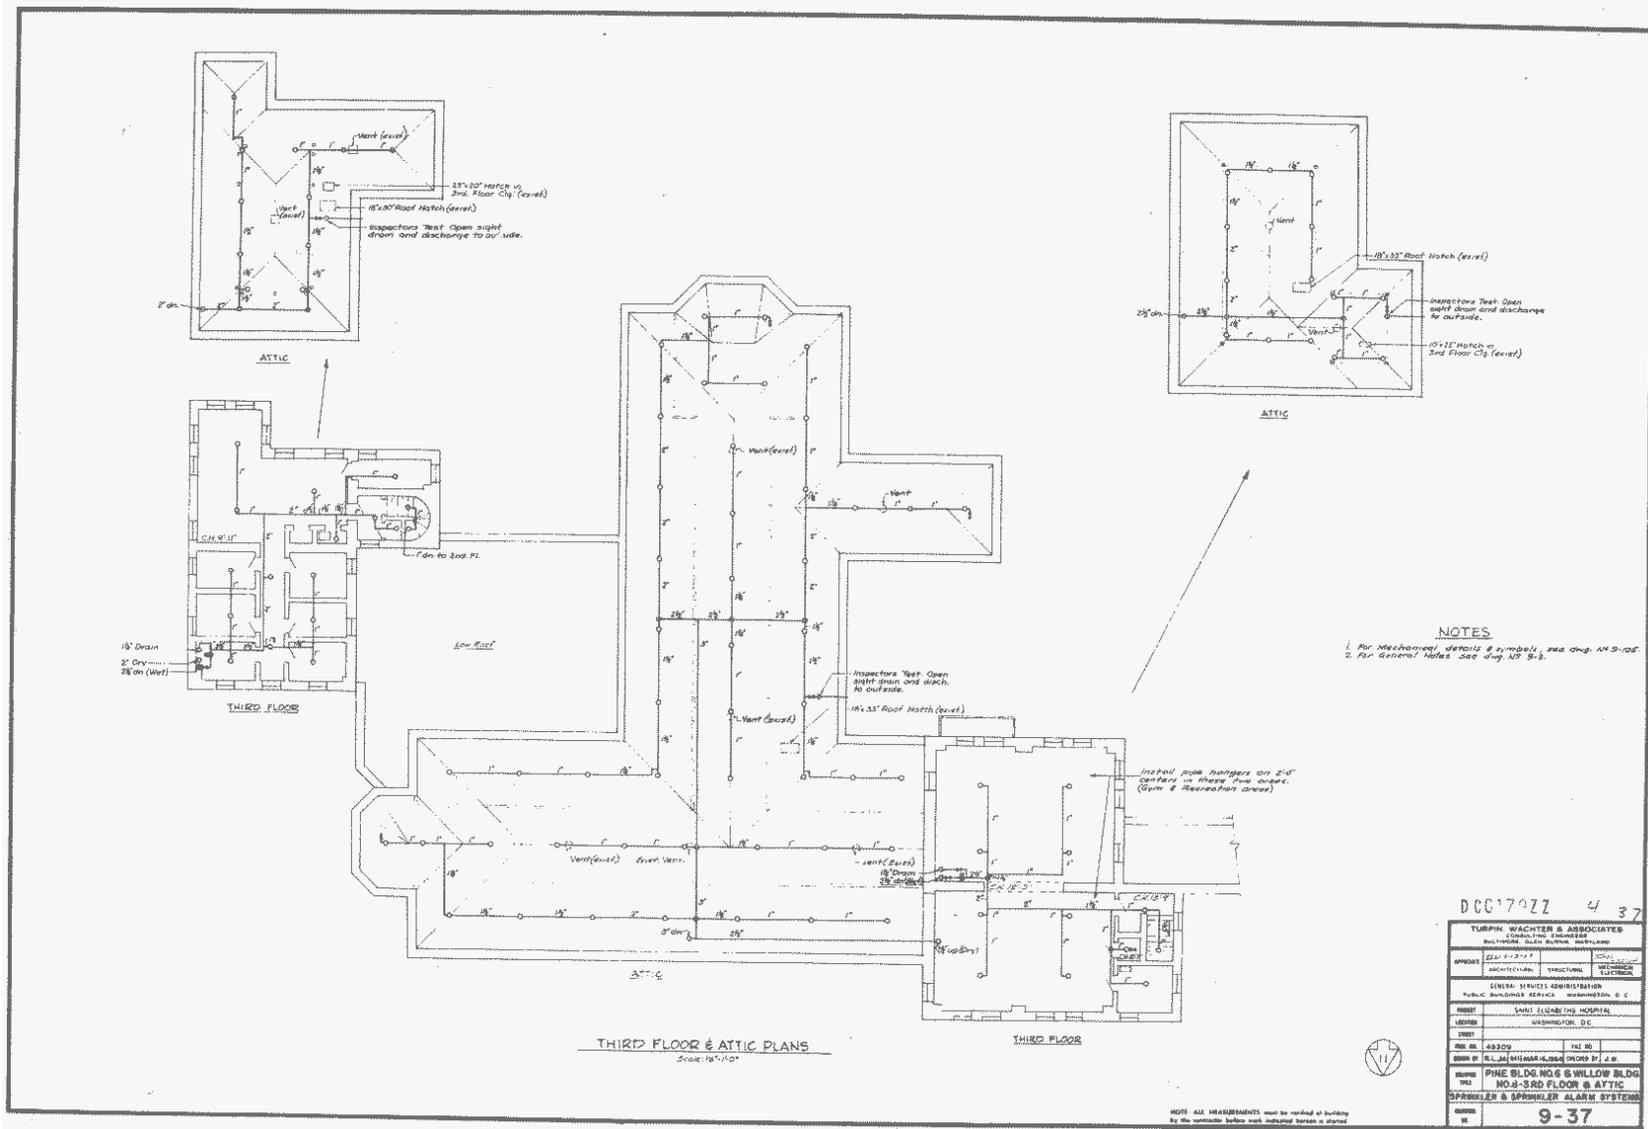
Third floor plan of Pine showing fire suppression system improvements, 1964. Source: GSA Archives, image DC0179SE0004.
